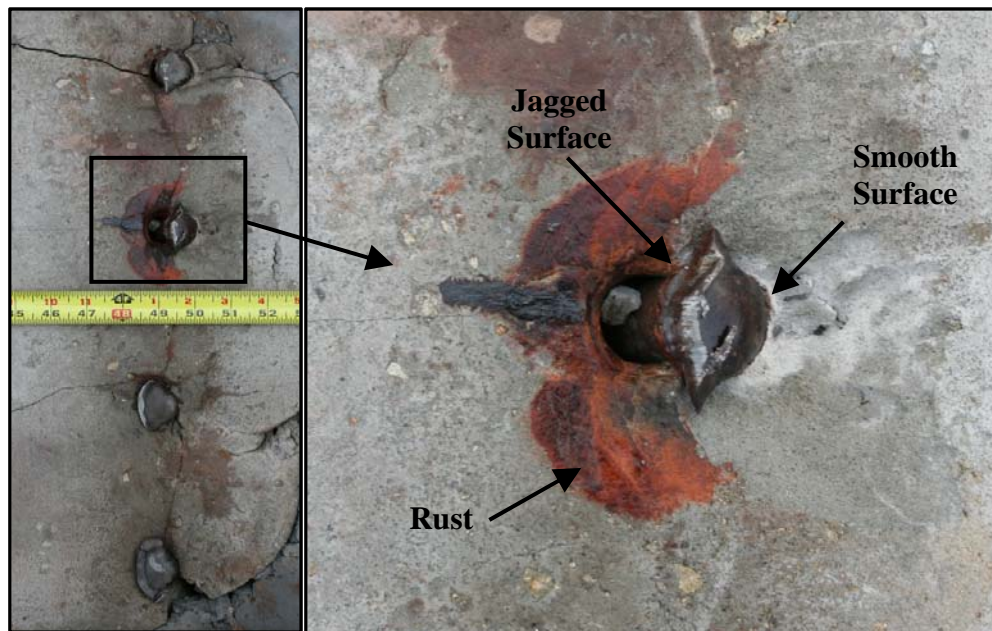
Illustration. Failure surface of typical shear stud in deck panel.
